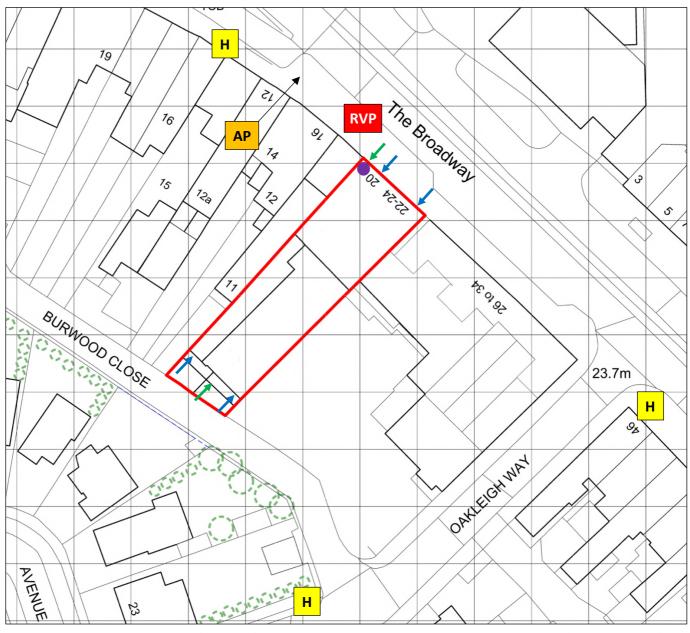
Location Plan showing the footprint of the site in red, the likely FRS RVP, entrance/exit to residential (green), location of dry riser inlet (purple) entrance/exit to retail units (blue), retail assembly point and the location of the nearest public hydrants.
